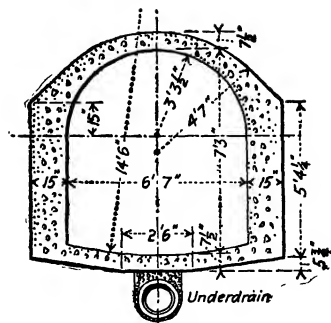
Cambridge, Mass., Marginal Conduit, 1908, Charles River Basin Com'n, Hiram A. Miller, Chief Engineer. Horseshoe section, 6 by 5 ft.
